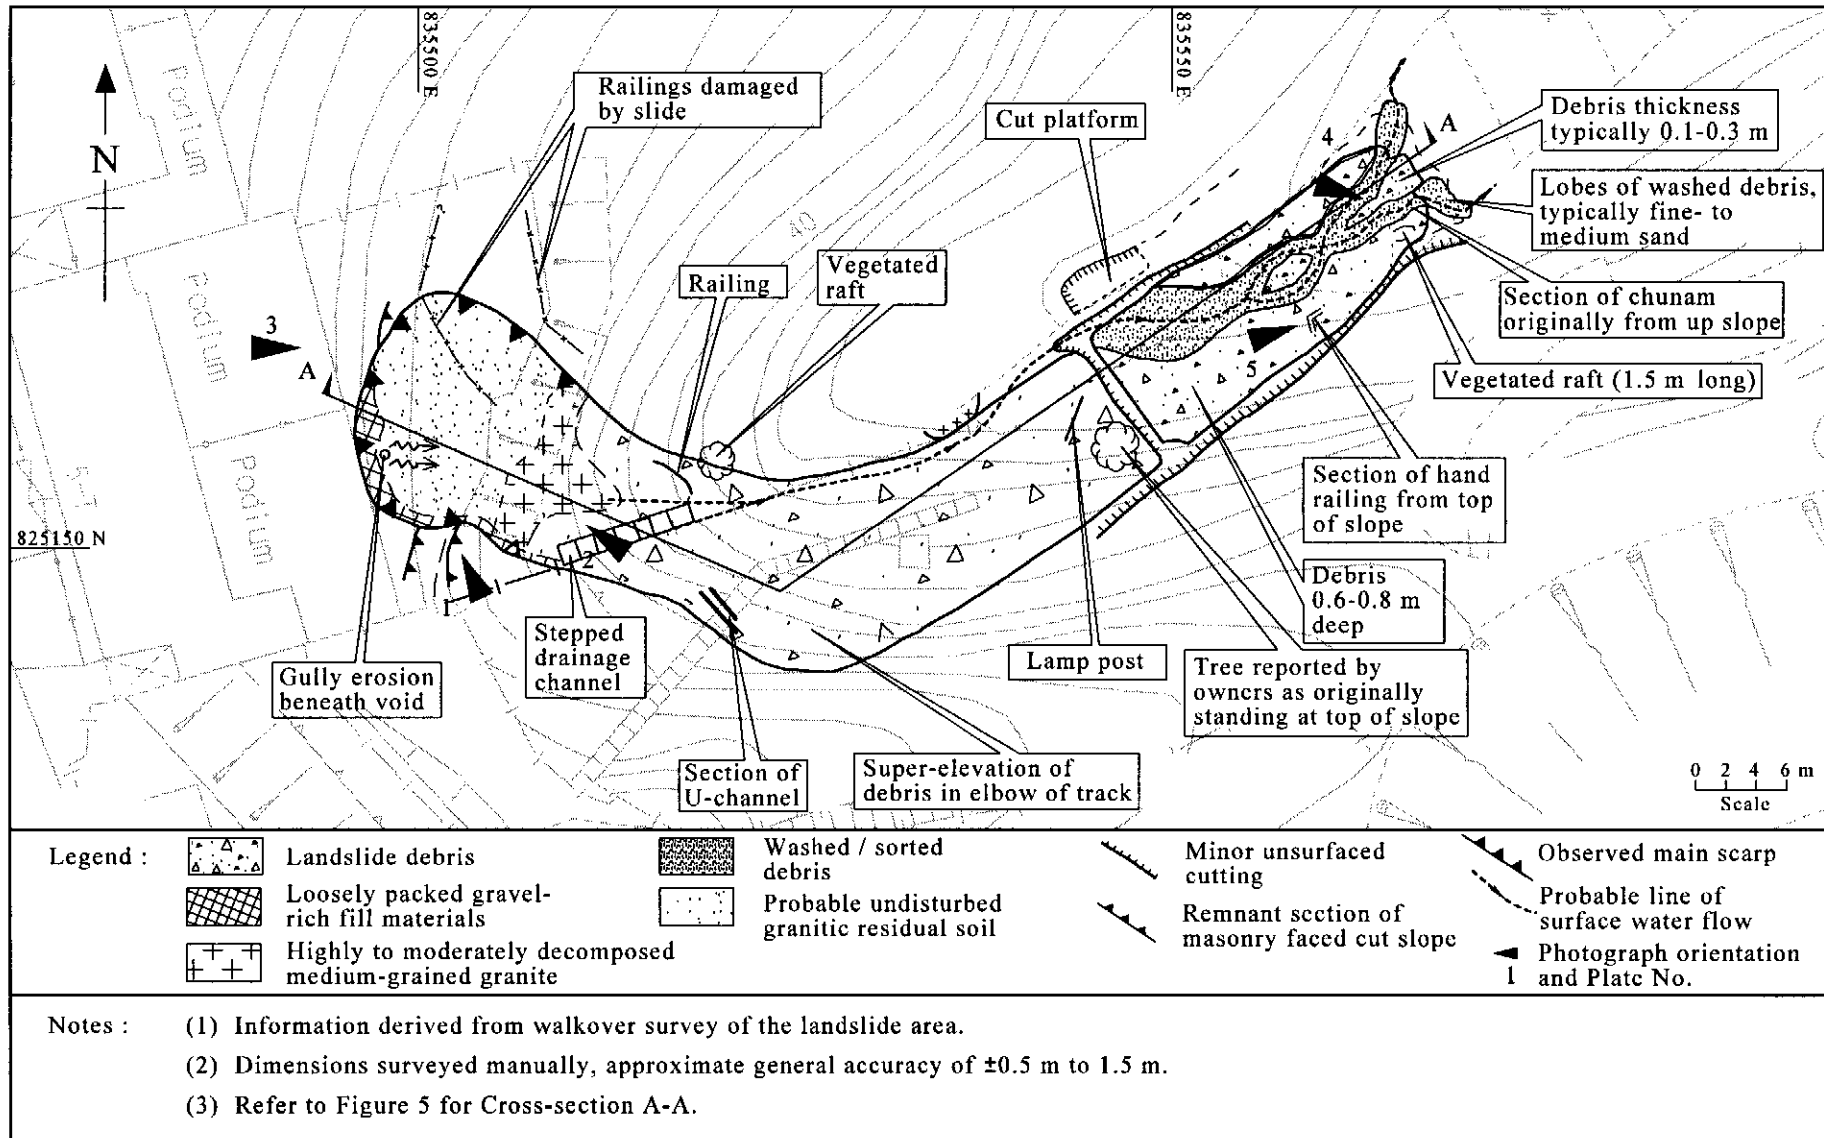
Site Location Plan and Details of the Landslide of 4 June 1997
